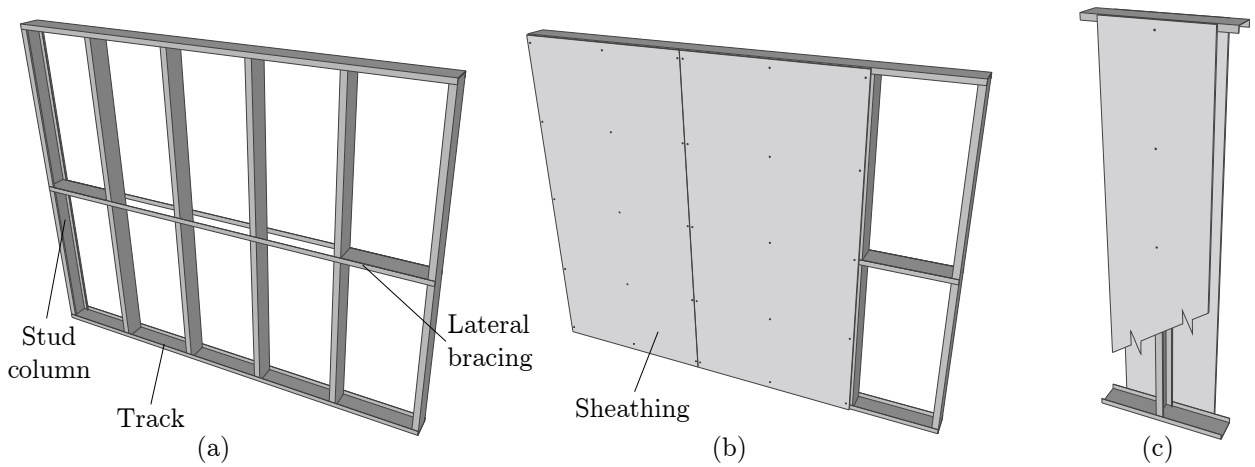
Illustrations of (a) stud wall with lateral bracing (b) stud wall with sheathing (c) single sheathed column
